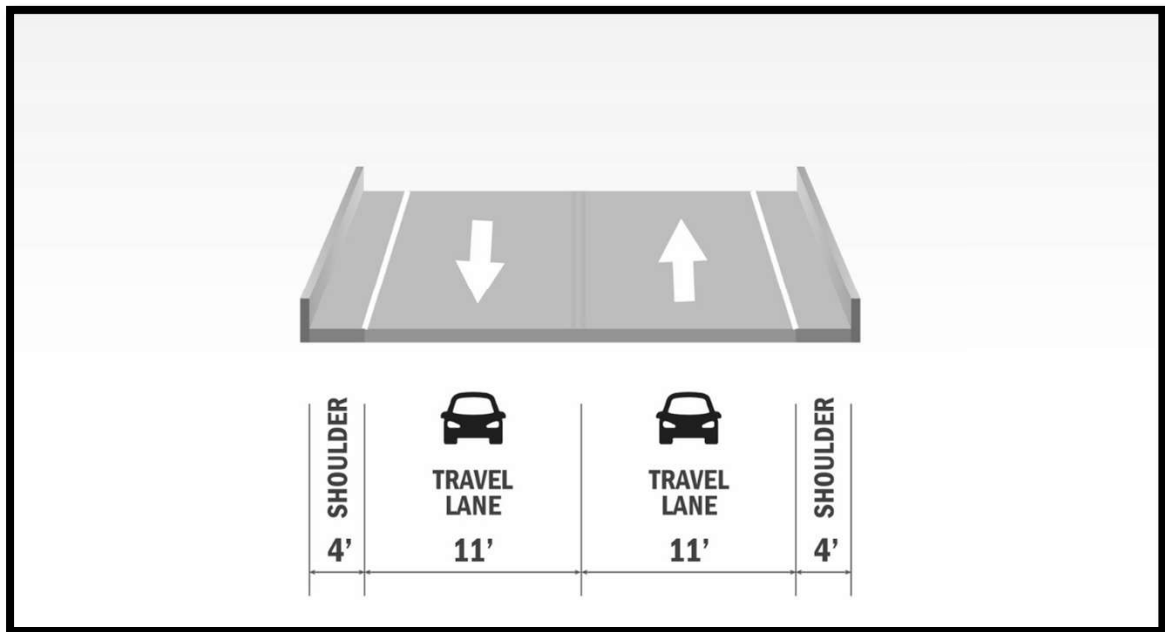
Existing Pioneer Trail Bridge over I-95 Typical Section
